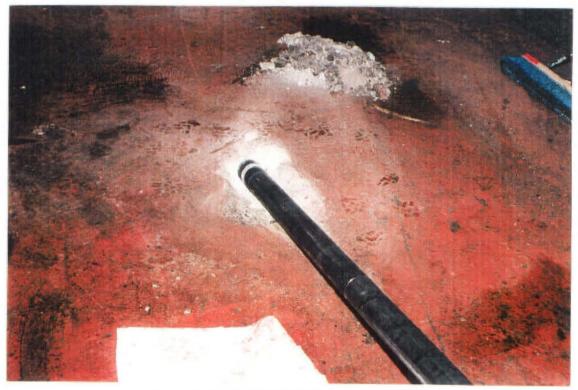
Advancing Boring B09A - Tank 9 Tunnel Floor
